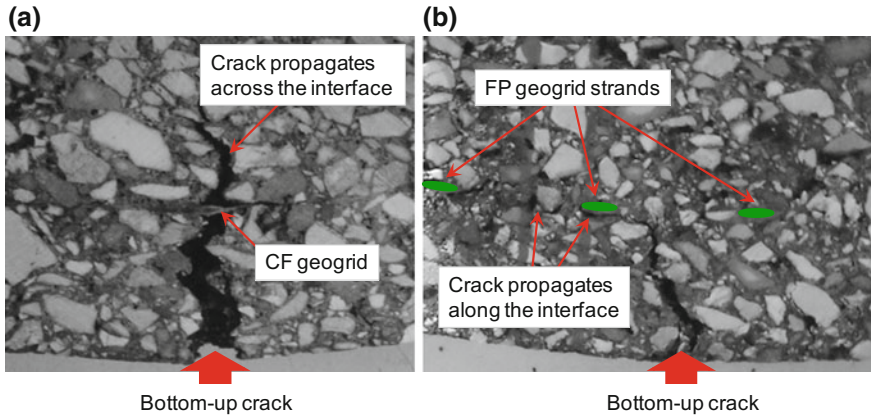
Failure of reinforced beams in cyclic 4PB test: a CF grid; b FP grid (Canestrari et al. 2015)
